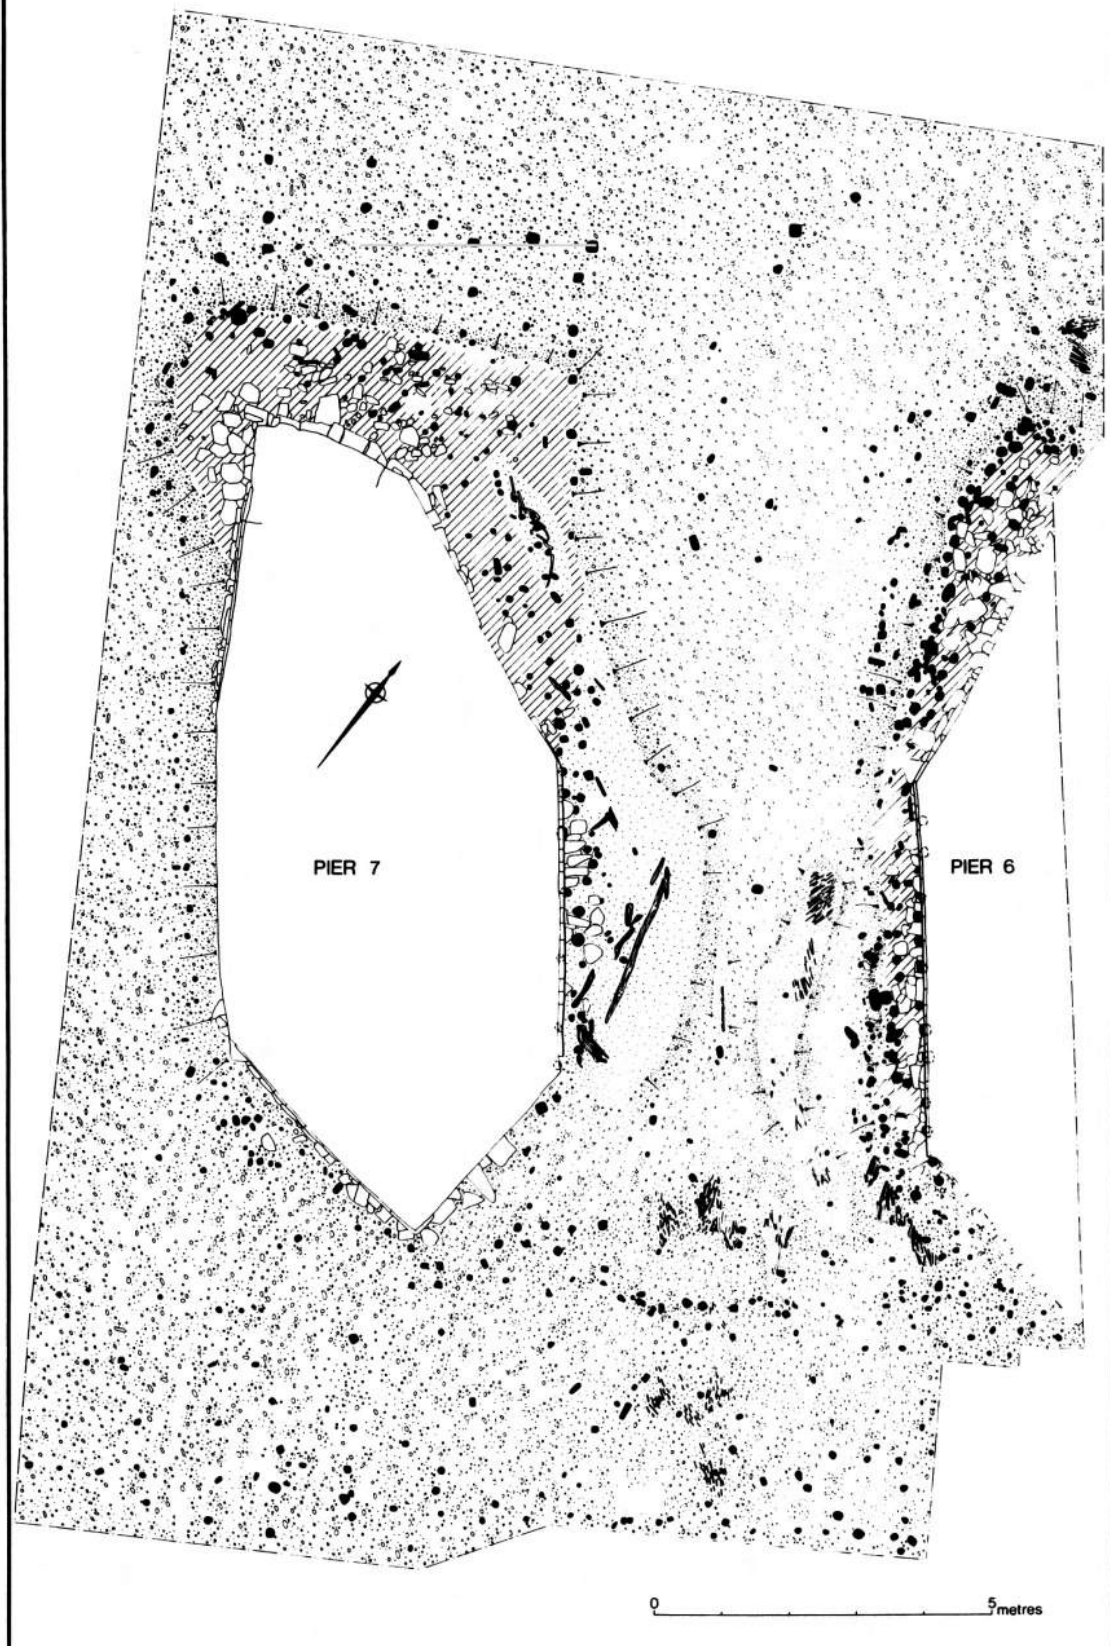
Plan showing excavated pier foundations and stake weir downstream (stake rows at bottom).
